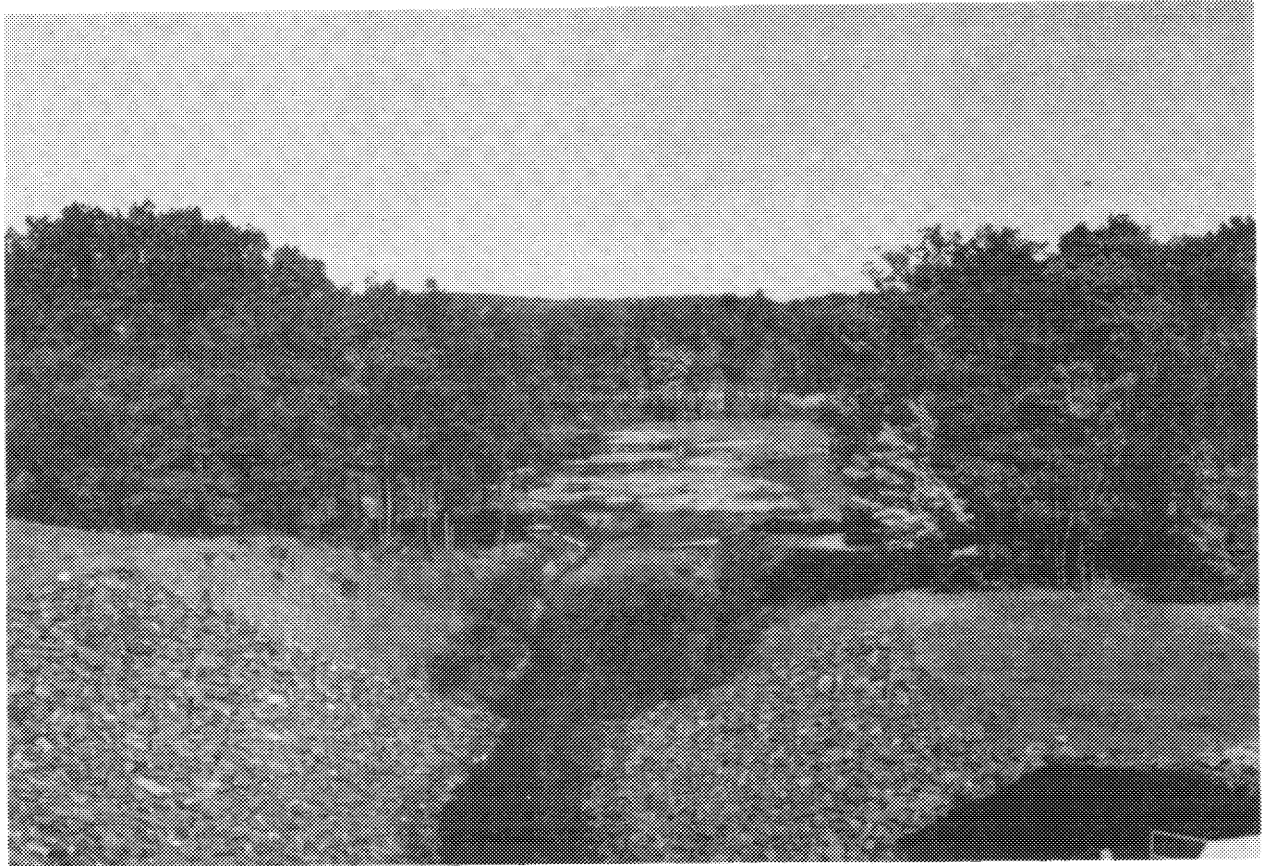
Inlet channel to Hodges Village Dam, at normal summer water level without flood storage (elevation 468 feet NGVD), as viewed from the west end of the dam near the gate house.
